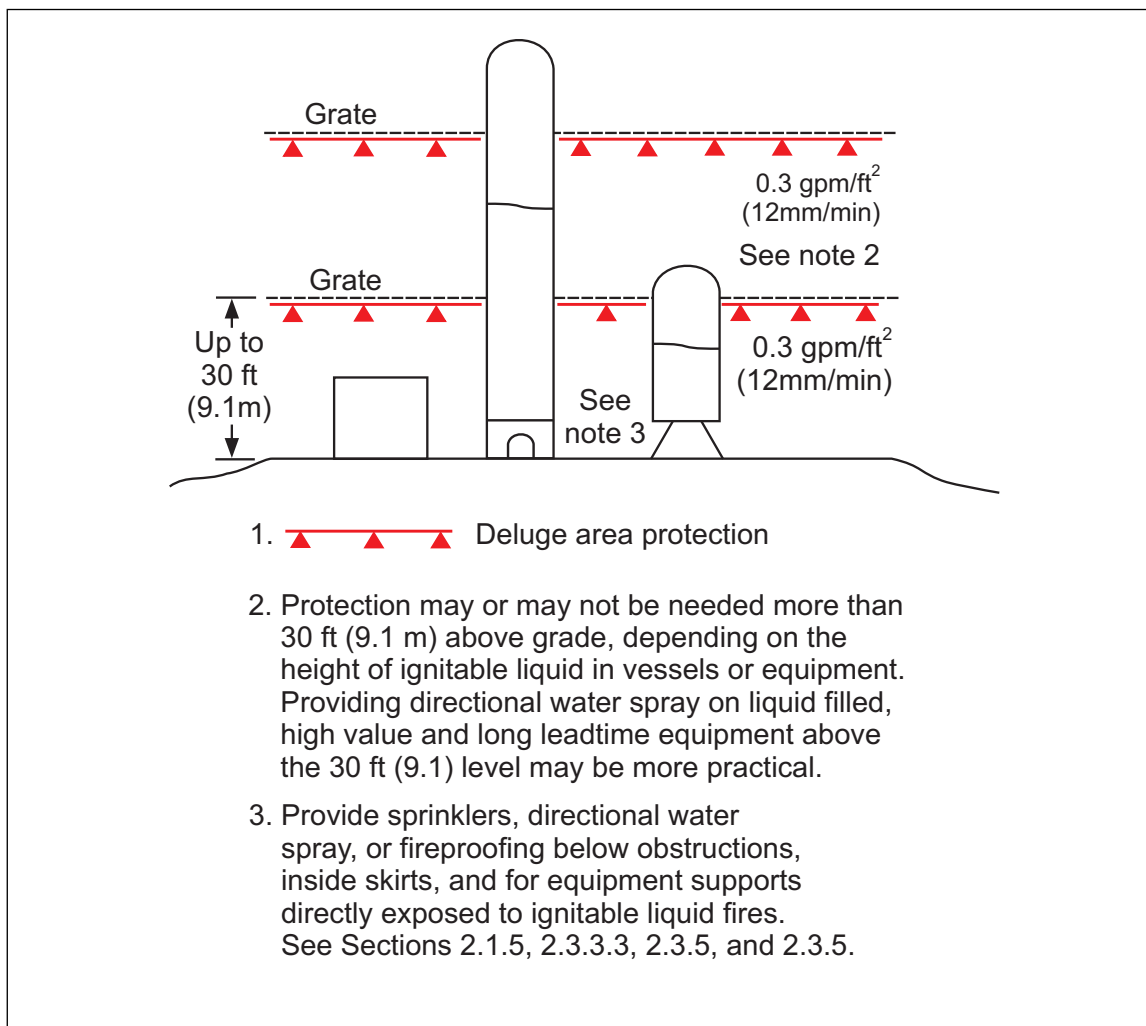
Outdoor processing structure: example of area-level deluge protection
